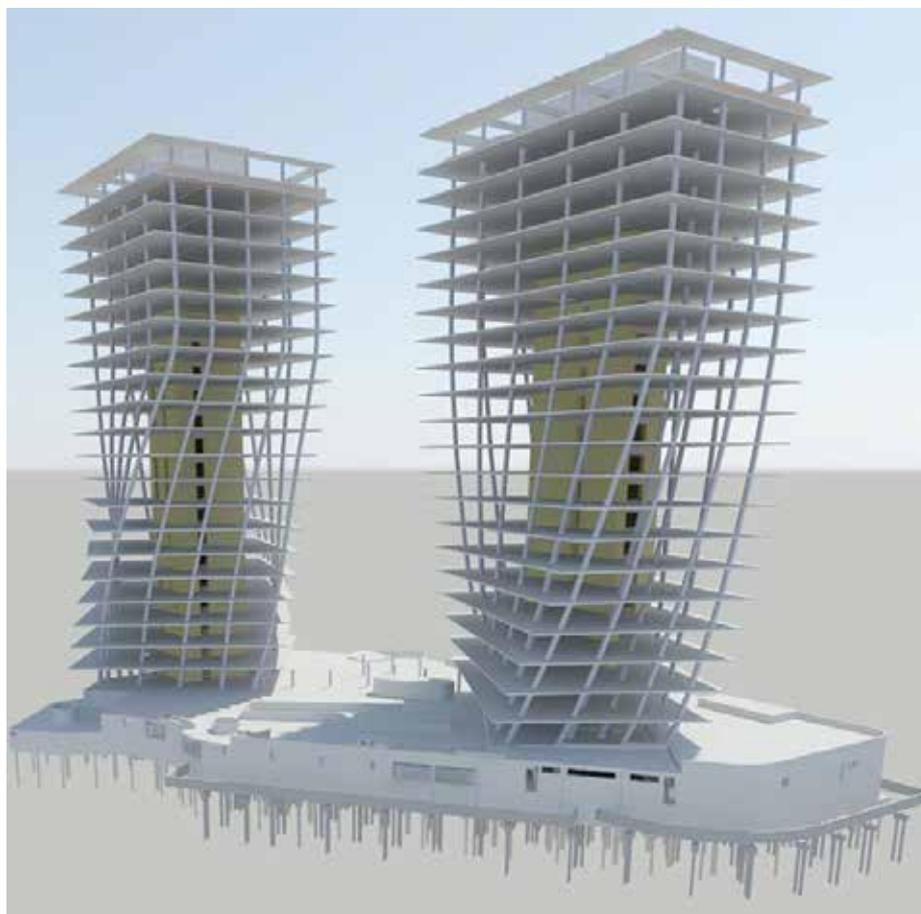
Structural Revit Model (Source: DeSimone Consulting Engineers, PLLC)
